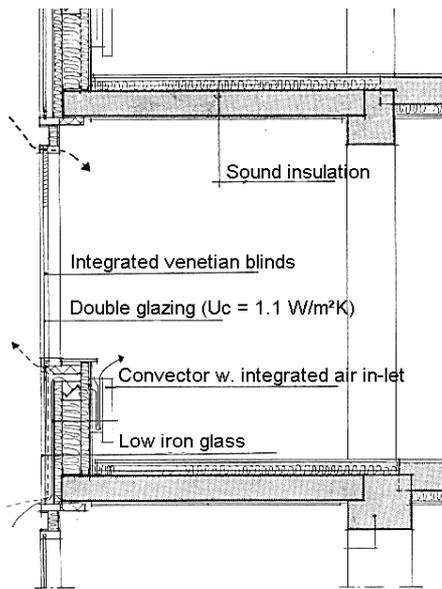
Vertical cross section of the ventilated solar wall and the glazed balcony
